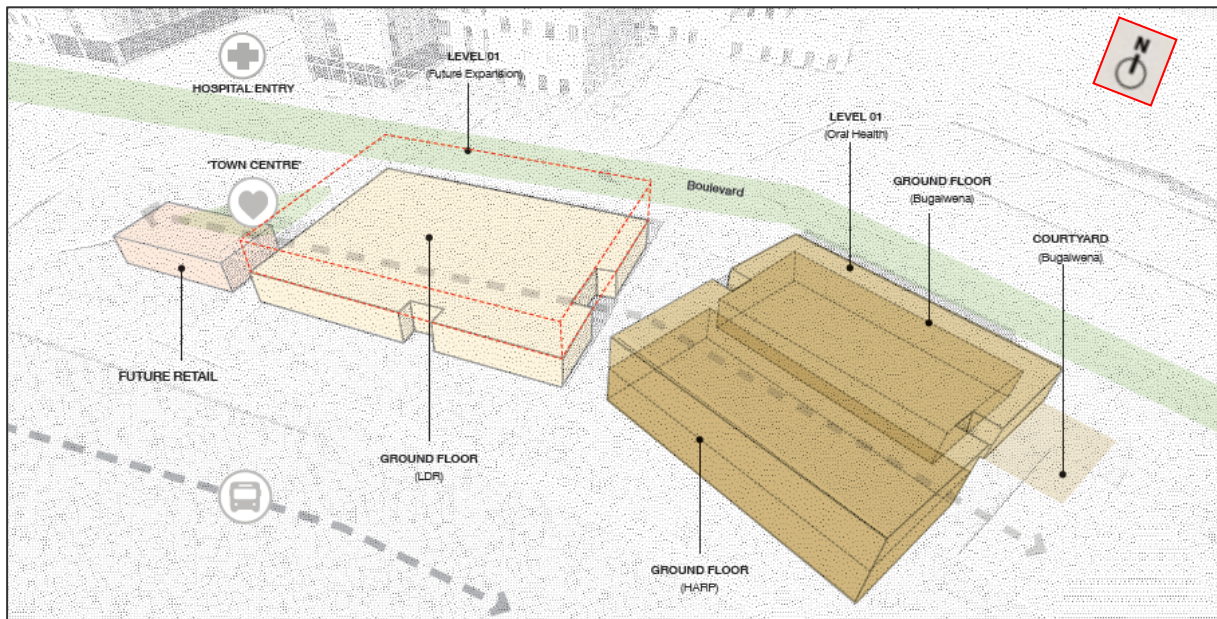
| Massing and location of Health Hub buildings (Source: Applicant's EIS)
